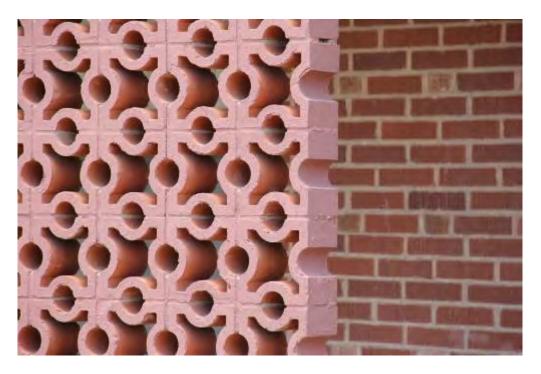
Entry façade of Apartment Building C. Camera facing east. (June 29, 2016)
